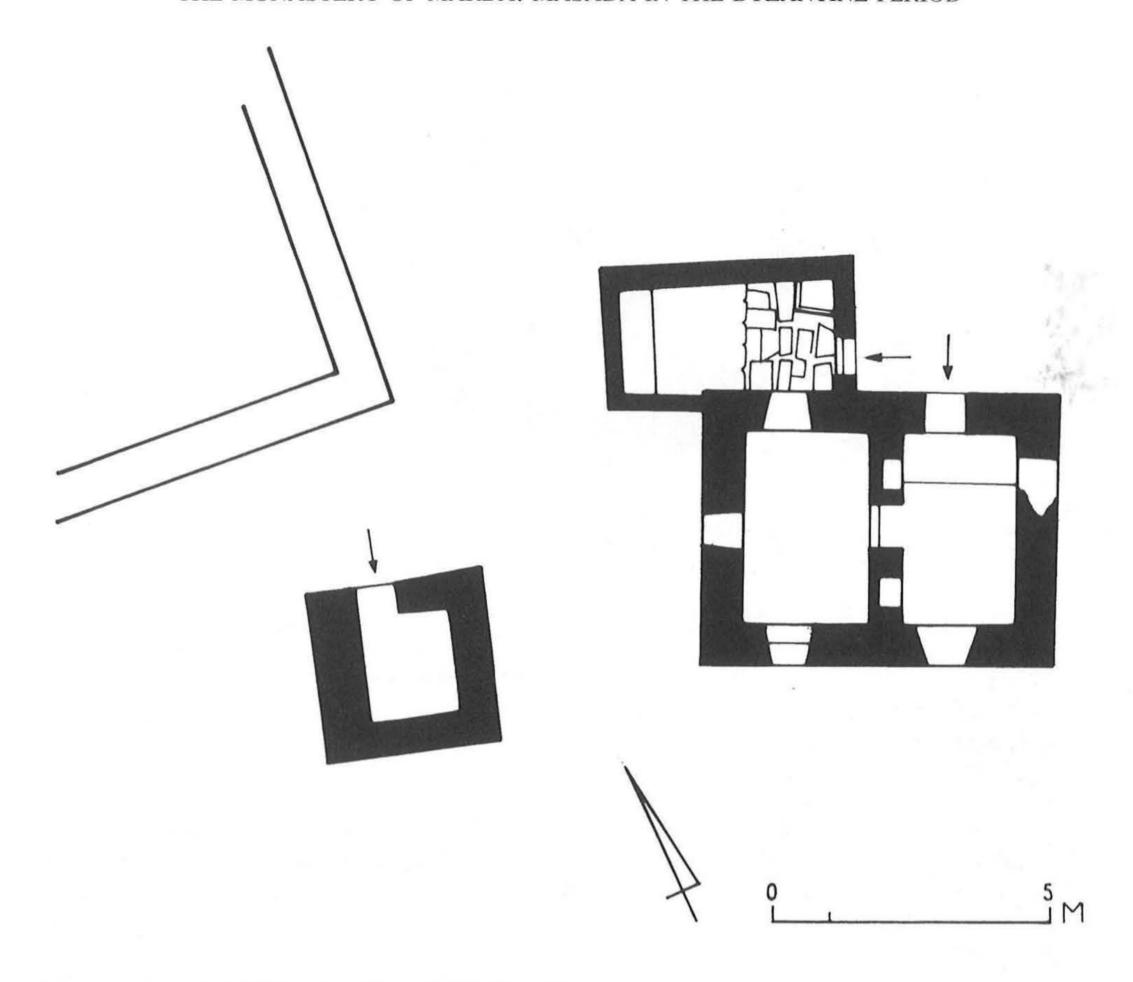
Plan of Cell 10 (after Masada III, Plan 23).
